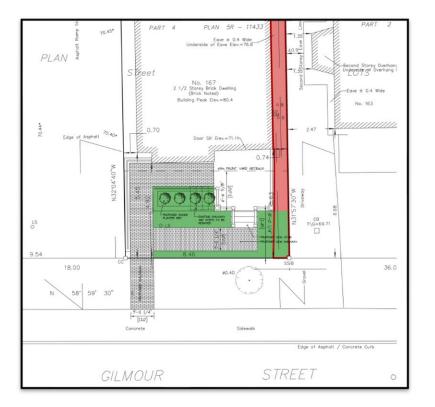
Location of interior side yard adjacent to porch (red) and landscaped area in front yard (green).
